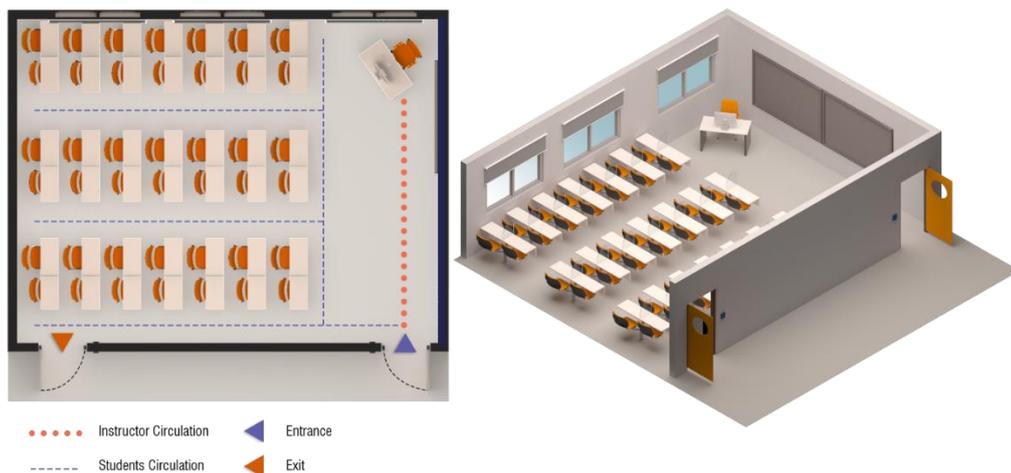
Modified classroom plan layout. Figure 5: Isometric for the redesigned classroom.
